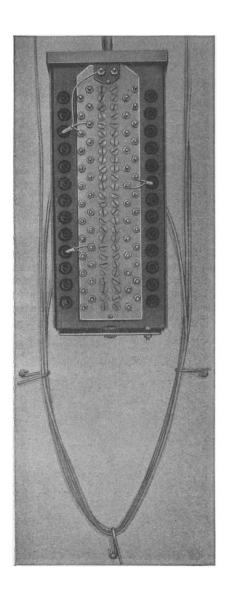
Typical Station Wiring of NH-Type Terminal.
